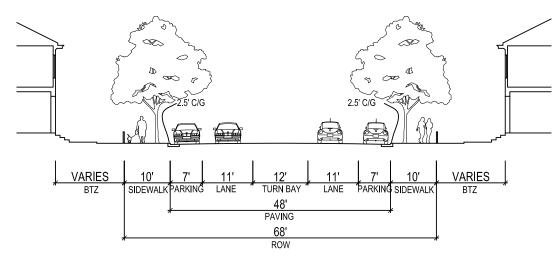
TYPICAL 'B' STREET CROSS SECTION
